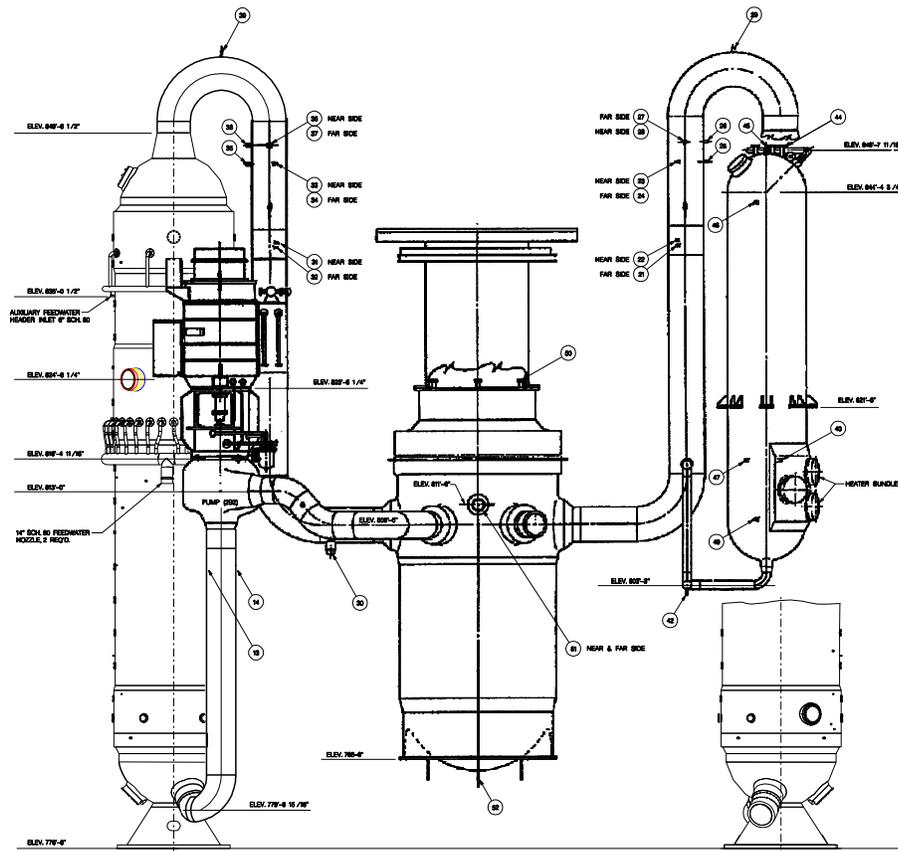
Reactor Coolant System, Arrangement Elevation (Unit 3)
